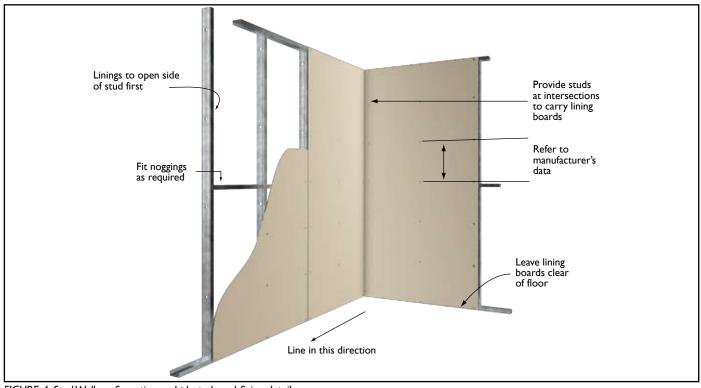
Stud Wall configuration and plasterboard fixing detail
